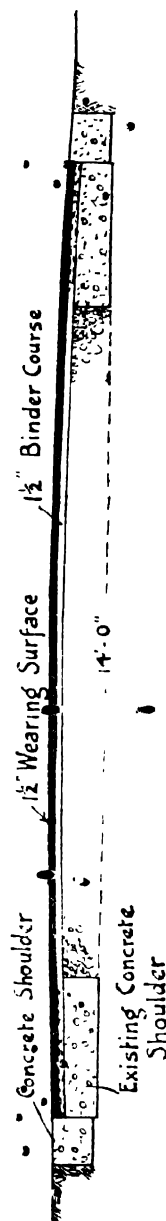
Section of Macadam Widened with Concrete Strips and Completely Re-surfaced with Bituminous Wearing Course.
